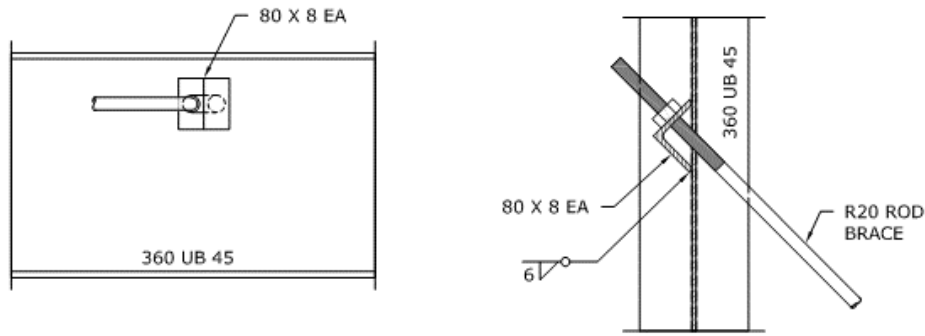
Extract from structural plans of connection of purlin struts to tension-only bracing
